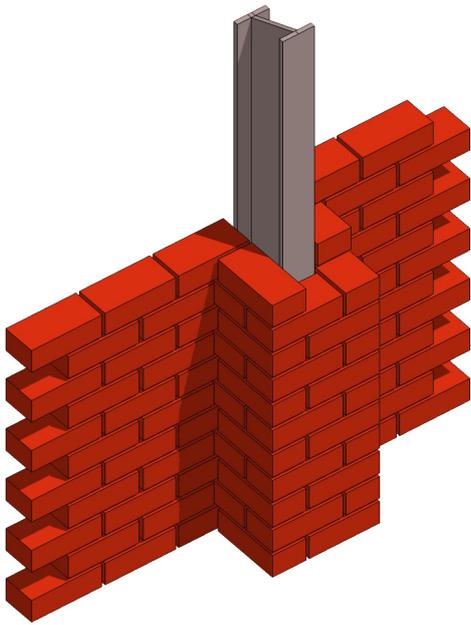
3D diagram illustrating facade detailing of Retort no. 1 & 2.
